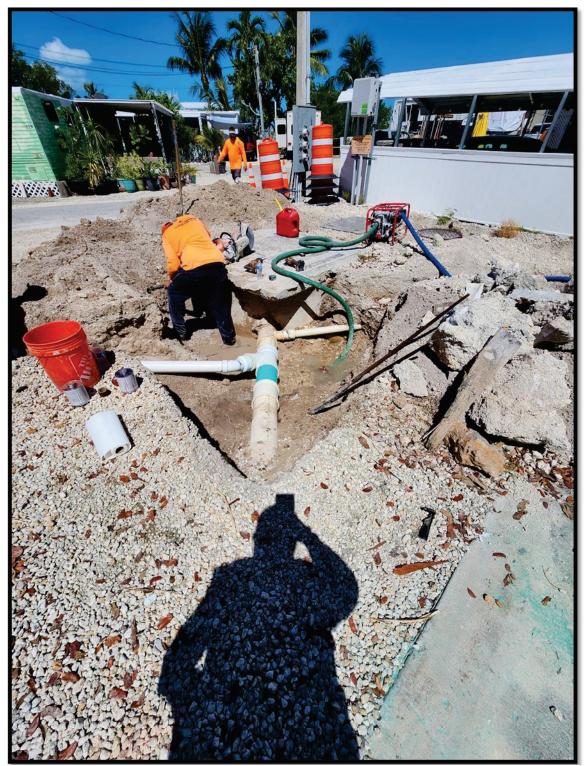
Keys Holding installing new pipe work for the lift station. Section of 8"SDR-26 PVC, 8"x6" PVC WYE, and 6"x4" PVC Reducer Installed at Southeast Side of Existing Lift Station.
